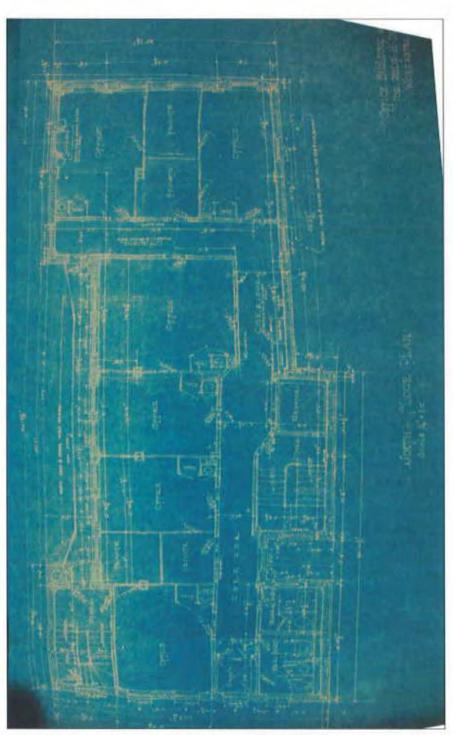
1924 Duprey Building, sixth floor plan. Reproduced by permission from the Massachusetts State Archives.
